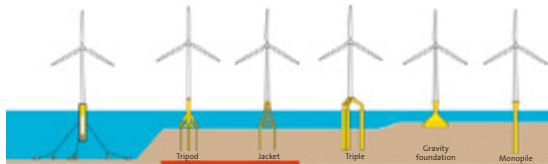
Foundation Structures; source: Foundation Offshore Wind Energy
